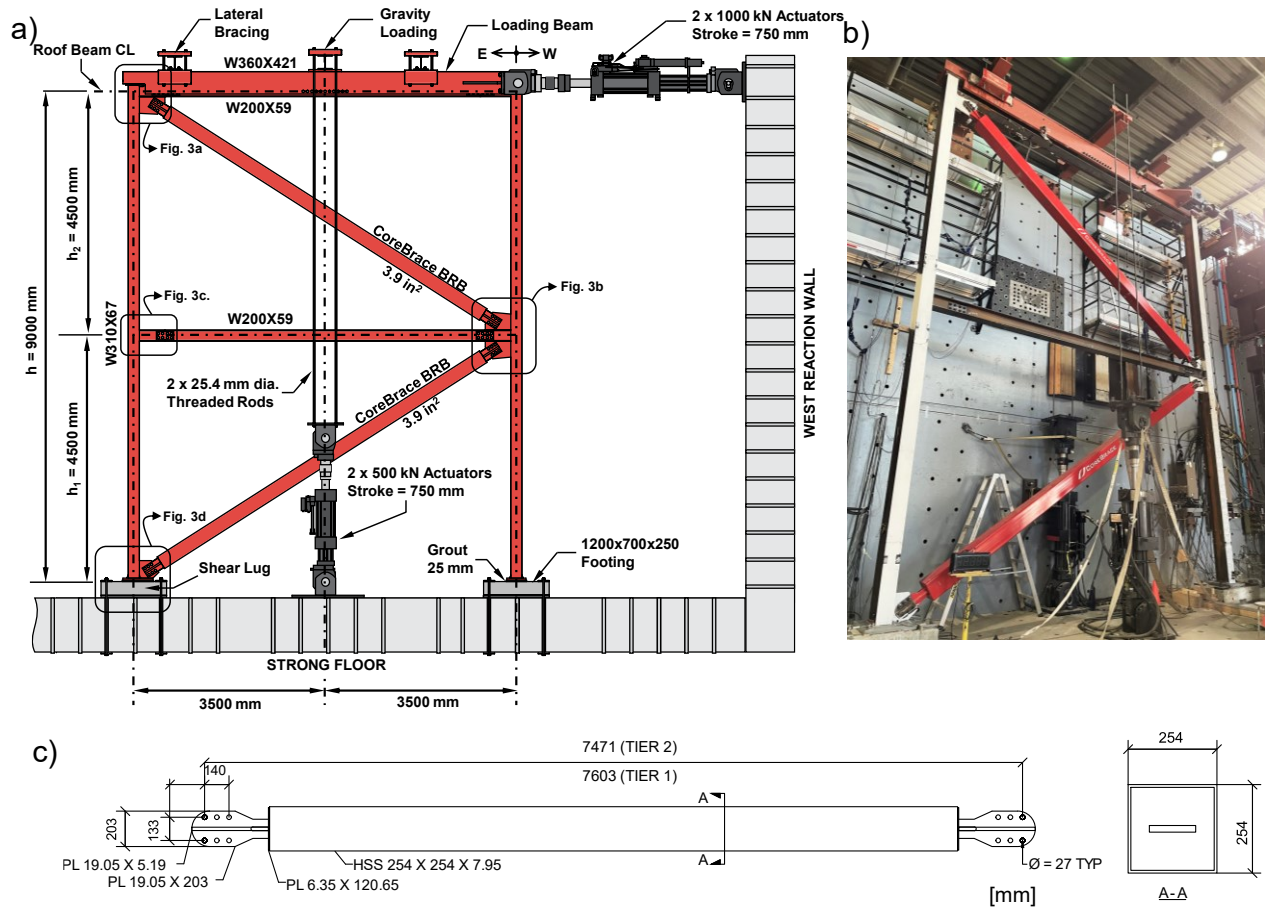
a) Test frame and setup; b) Photograph of test frame before the test; c) BRB dimensions.
